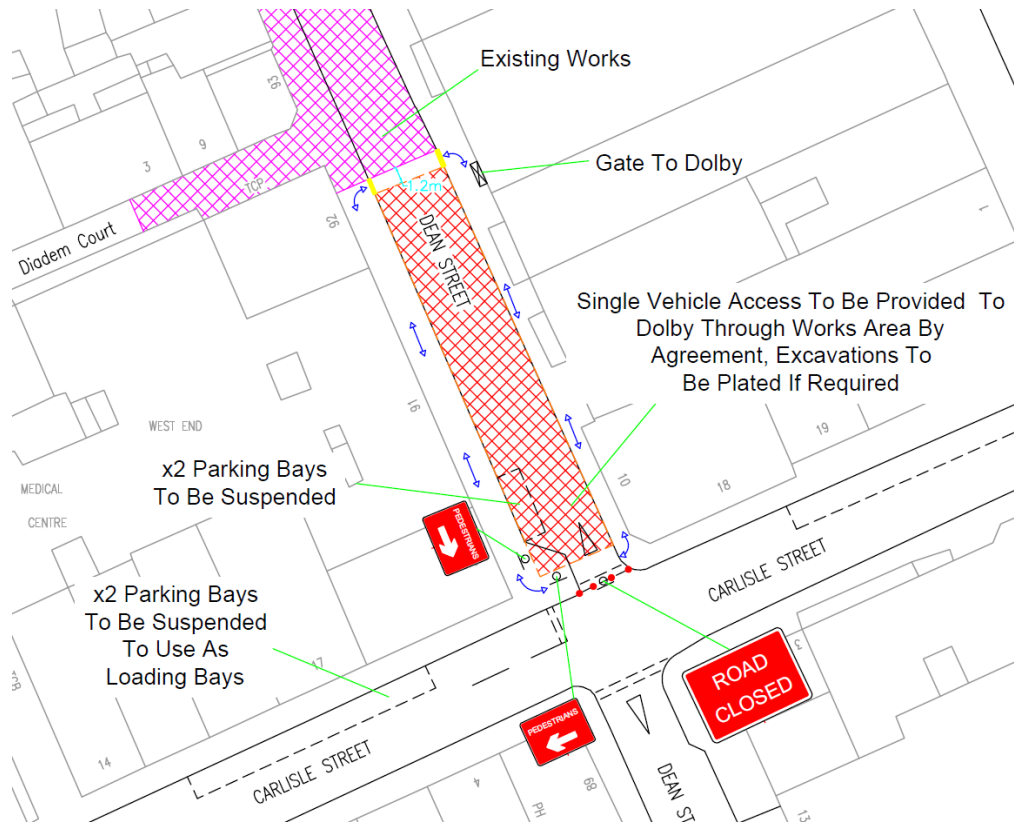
Traffic Management Drawing for Dean Street South Works
